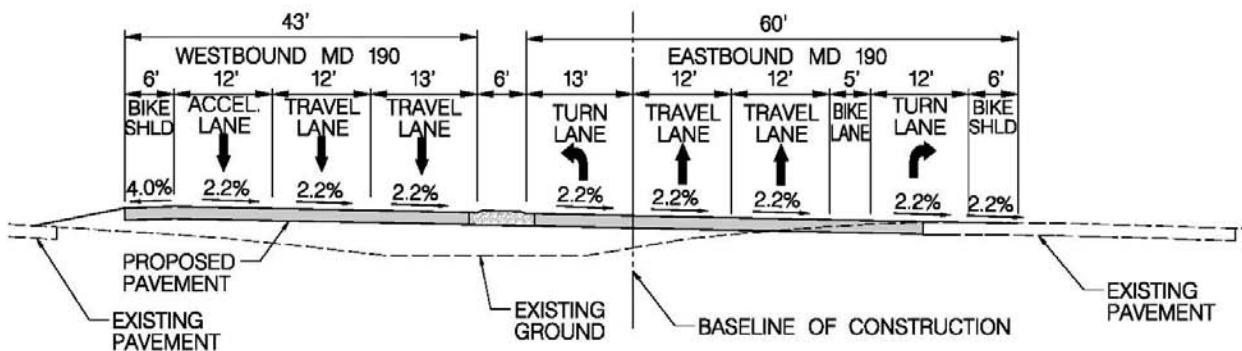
Alternative 1 - MD 190 Intersection West of Pyle Road
